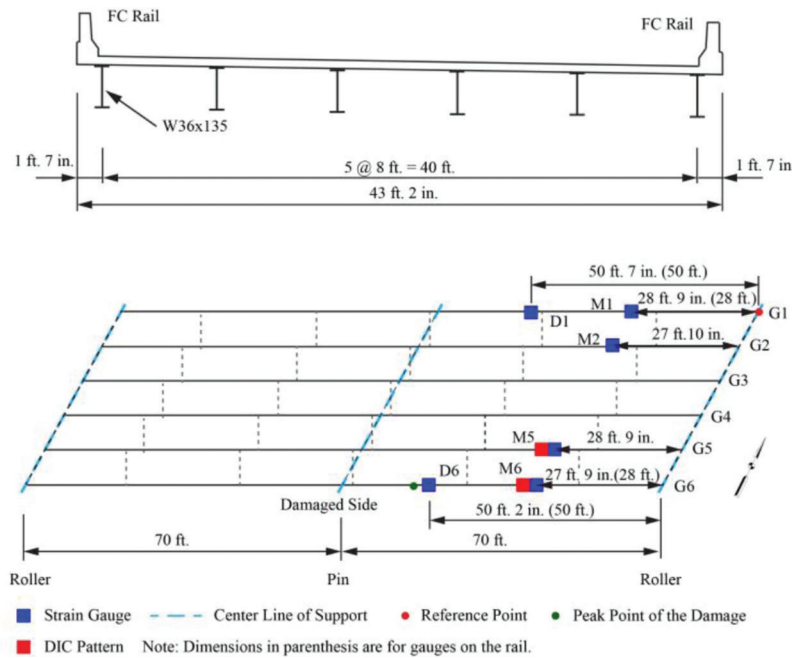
Cross-section, frame plan, and pattern locations for Asset 037-55-05265.
